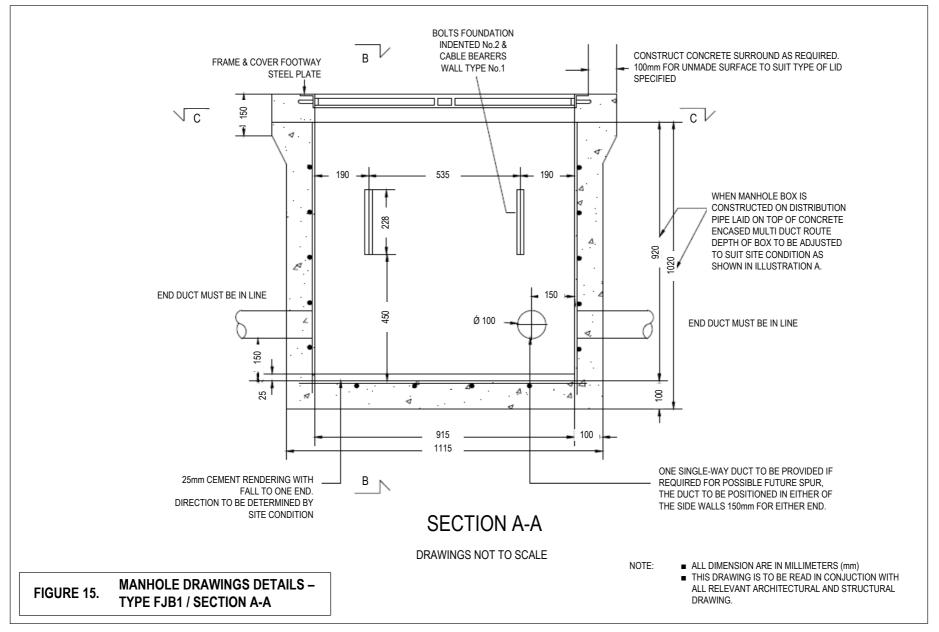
Manhole drawings details - Type FJB1 / section A-A
